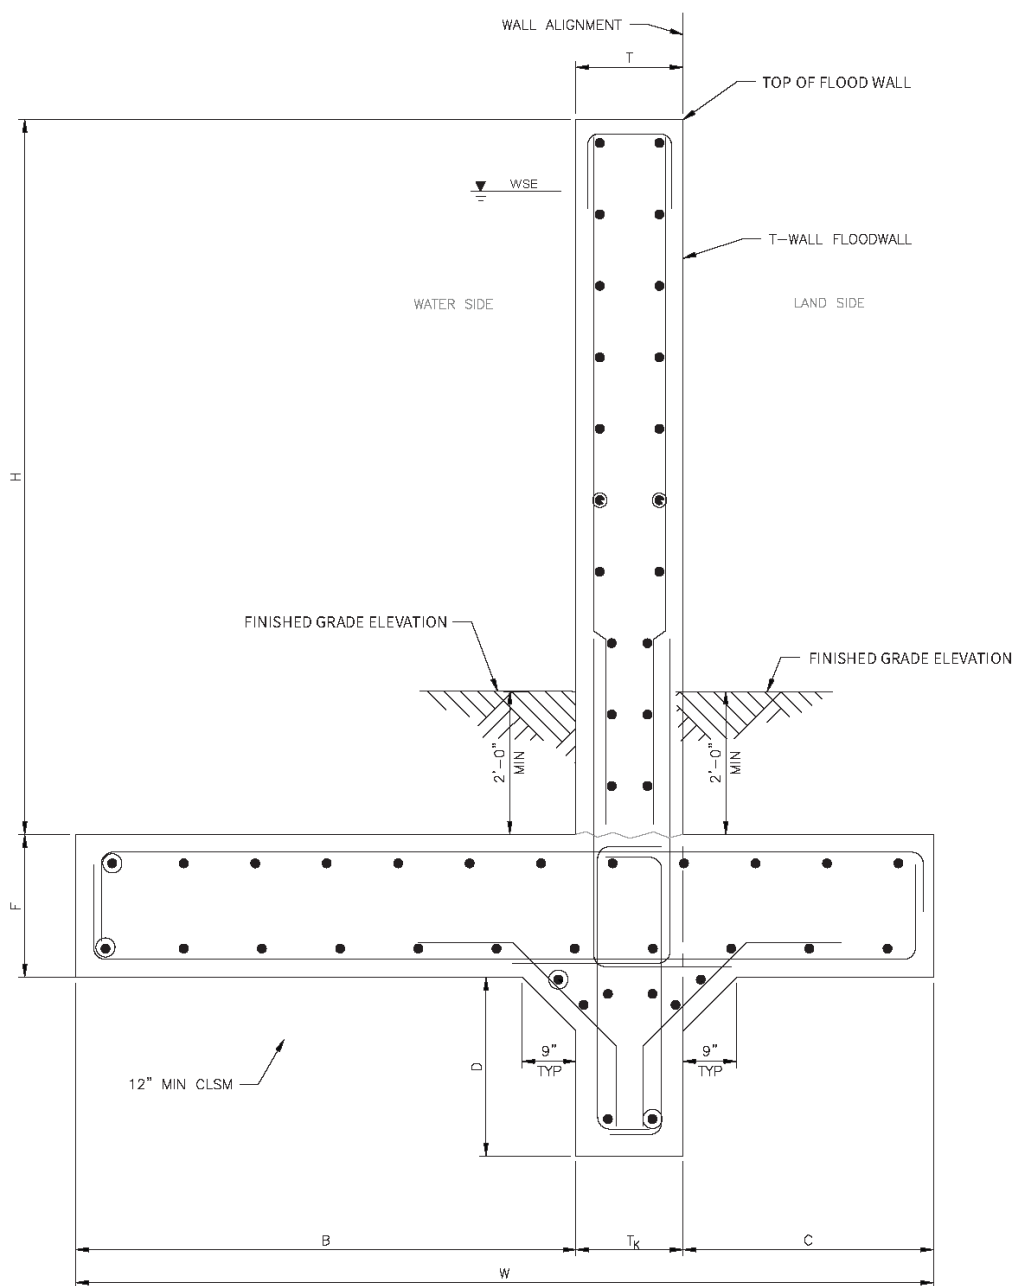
Typical Concrete T-Wall Floodwall Cross Section
